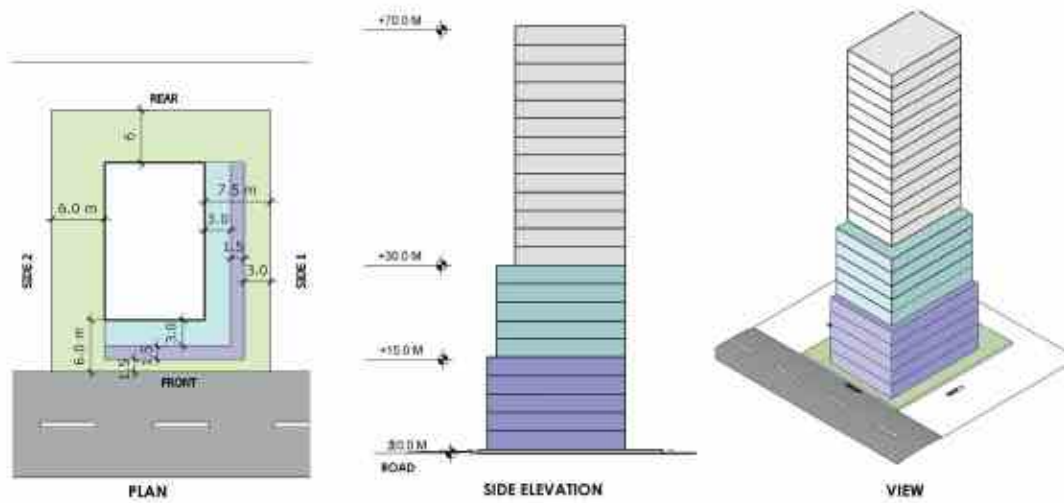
Maximum building envelope for building with height upto 120.00 M.
